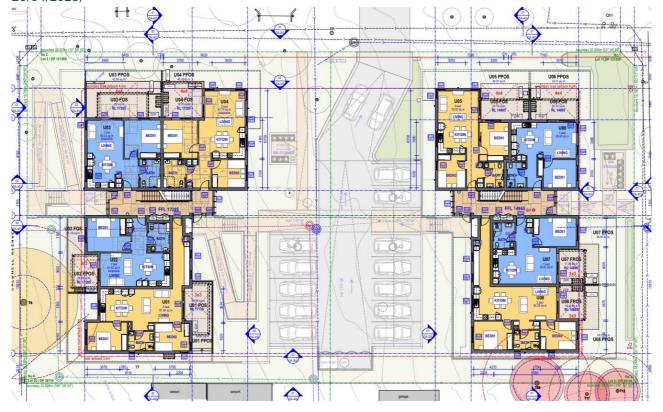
Extract from Architectural Plans – General Arrangement Plan – Ground Level (Source: Architectural Plans, Kennedy Associates Architects, dated 26/04/2023)
